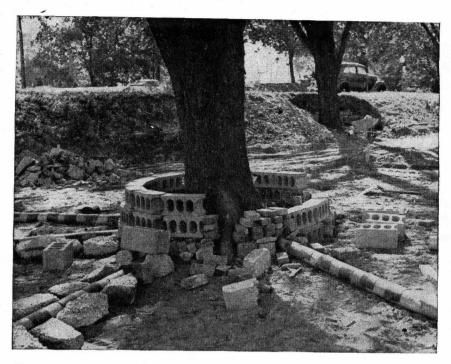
Concrete blocks with hollows that extend through the wall provide the necessary openings into the stone-filled layer. Turning the blocks or using solid materials near the top of the well will prevent soil from sifting through the wall into the well.
